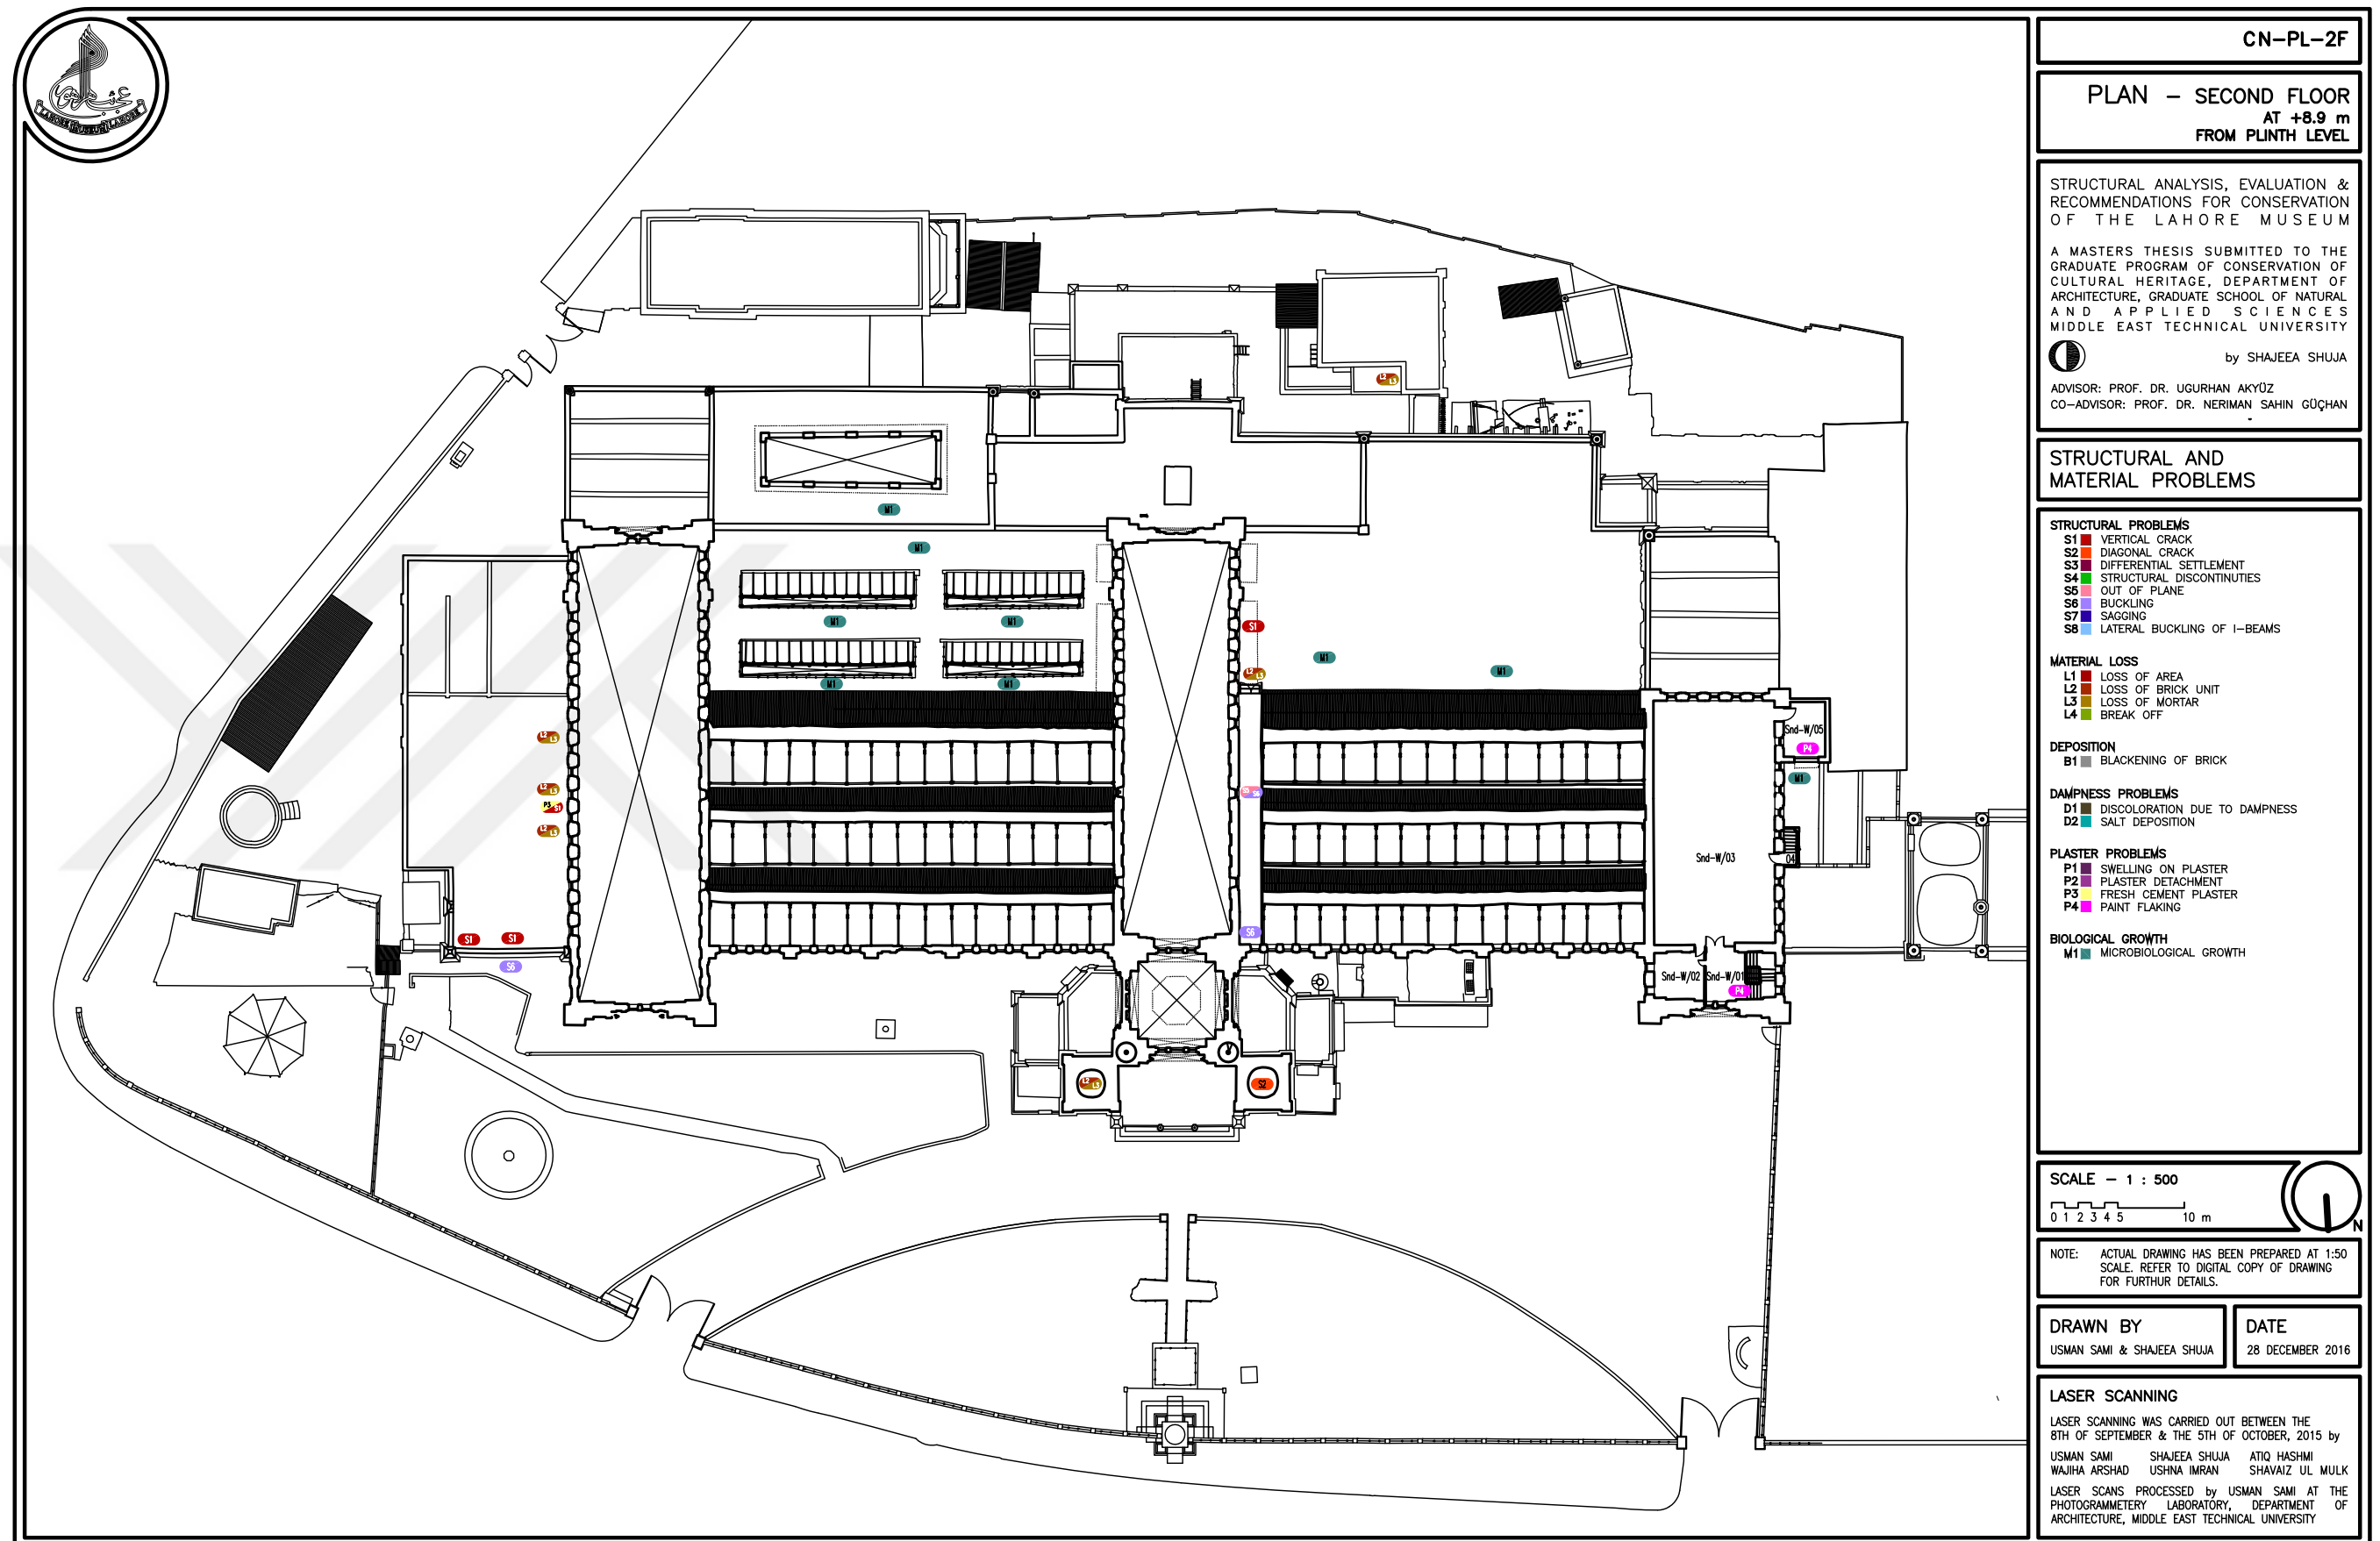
CN-PL-2F – Structural and Material Problems – Plan – Second Floor (2016)
